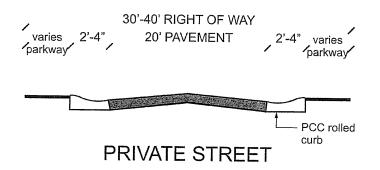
ROADWAY CONCEPT PLANS
